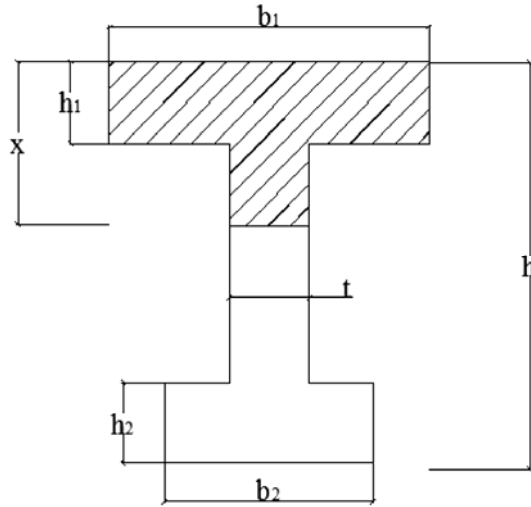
Scheme to determine the parameters of the approximant for a reinforced concrete I-section with a normal crack.
